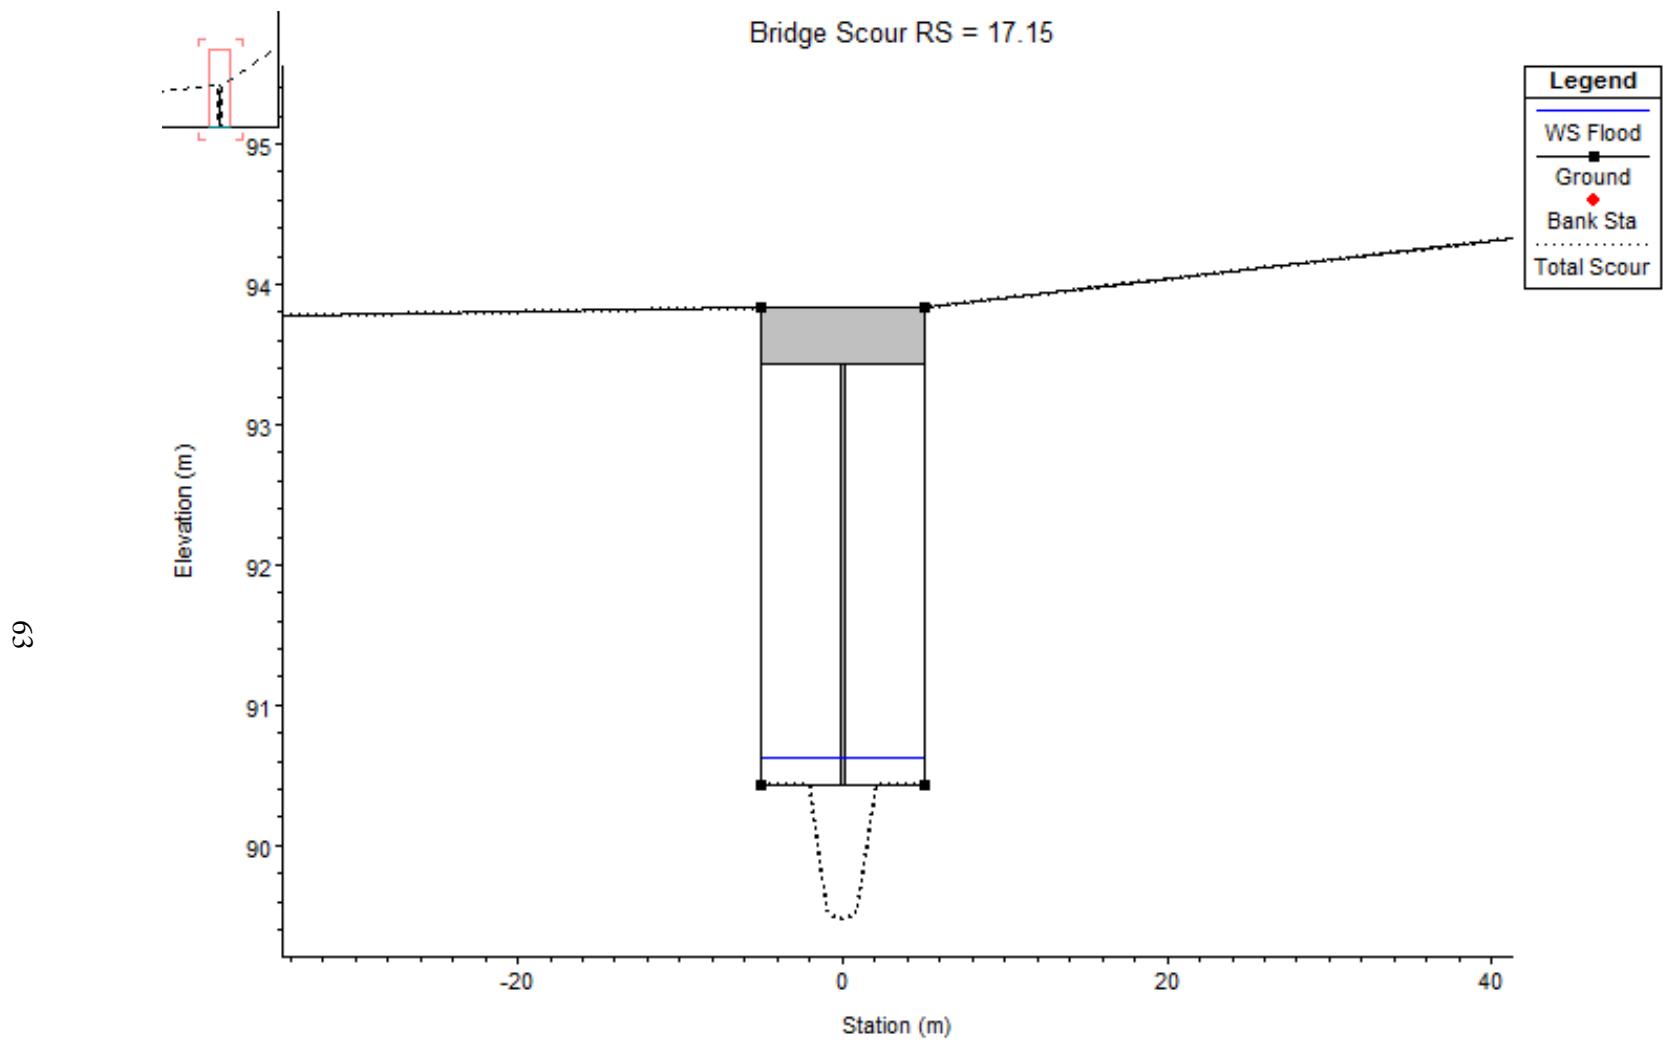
Scouring at bridge of Section 8 on Bostancı Creek in cross-sectional view
